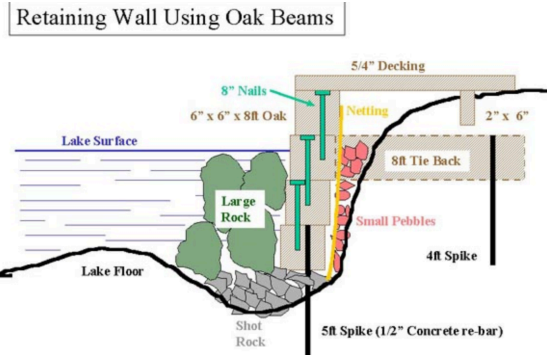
A hypothetical example of a retaining wall and its design methods that could similarly be constructed along the bank of Westhampton Lake (Seawall, n.d.; *There are 3 ways to build a retaining wall*, n.d.).
